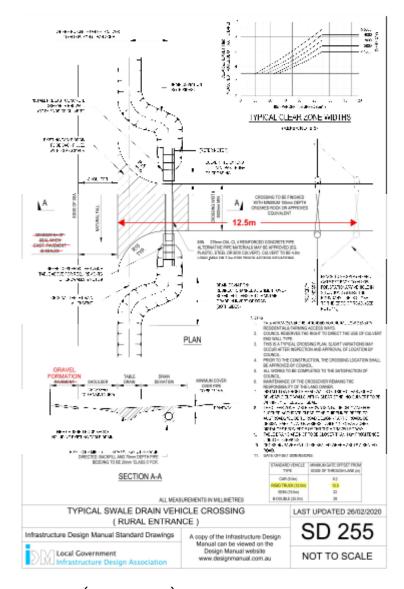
Typical detail (Marked-up) for new vehicular crossing in a rural setting.
